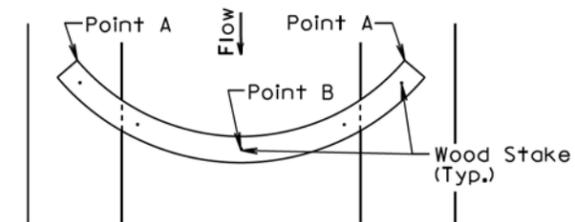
DETAIL B (TYPICAL OF ALL INSTALLATIONS)
